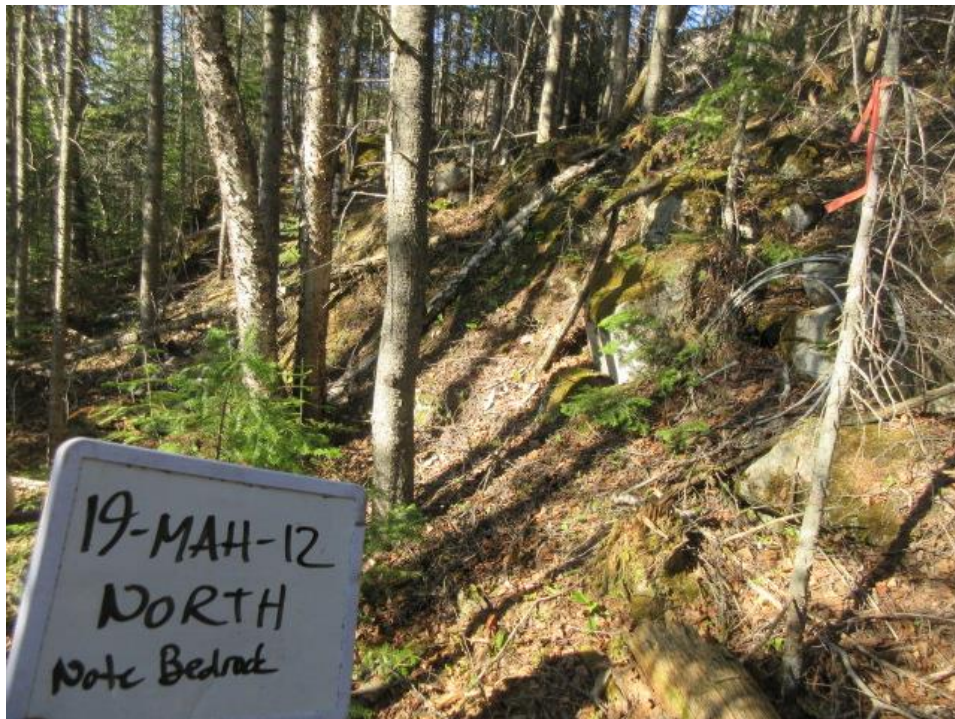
Section C - Toe of Hwy 17 existing embankment, possible bedrock near Station 19+550
